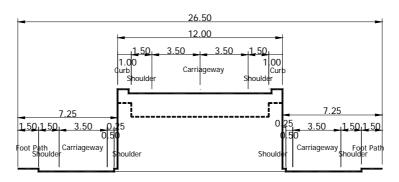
Proposed Cross Section for Flyover and Ramps
